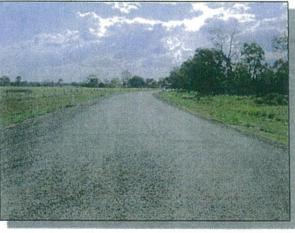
► Fogarty Road and Nine Mile Road intersection looking west
